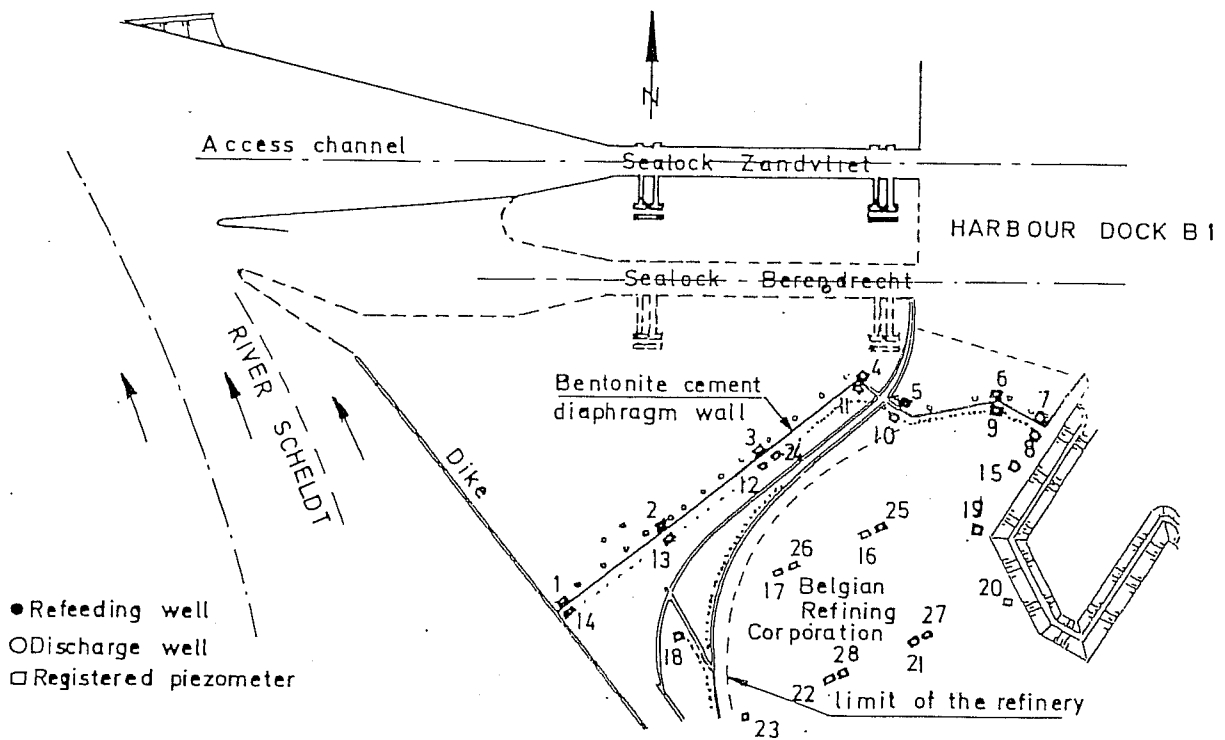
Situation of the bentonite-cement diaphragm wall, groundwater recharge system and registered piezometers
